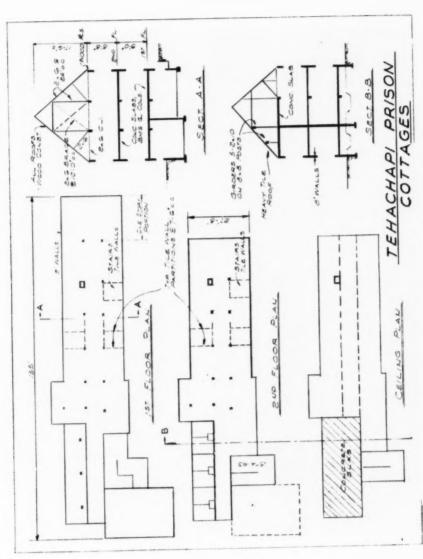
Framing for typical Cottage at Tehachapi State Prison.
